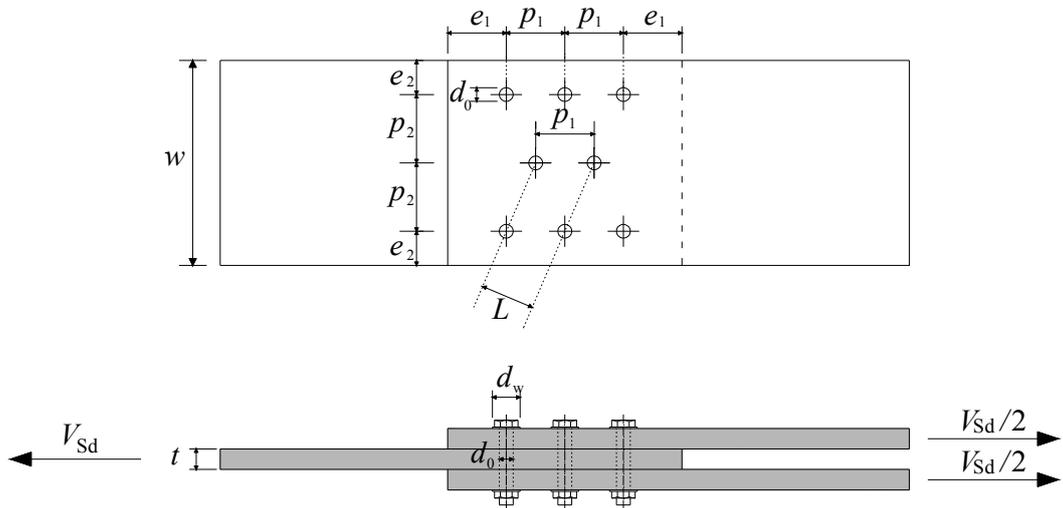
Bolted Lap Joint (symbols for staggered fasteners): staggered bolts.
